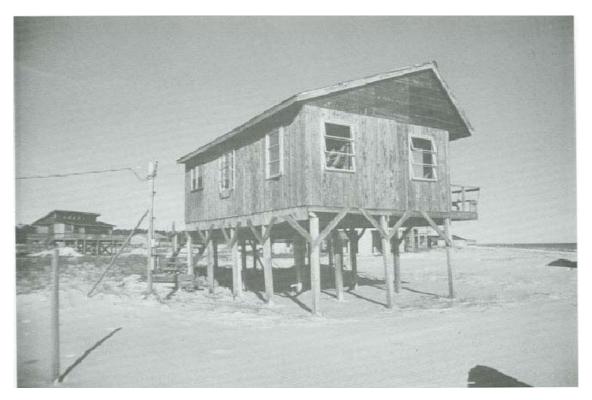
Pile-supported dwelling with inadequate pile to beam connections and insufficient pile penetration leans following wend loads and scour.
